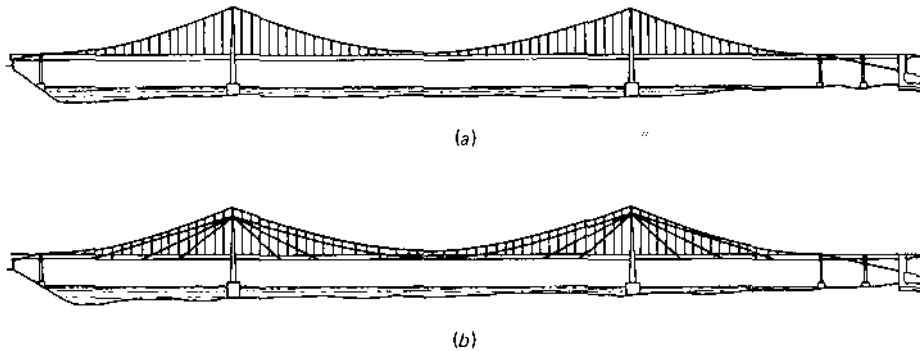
The Salazar Bridge: (a) elevation of present bridge, (b) elevation of future bridge.
